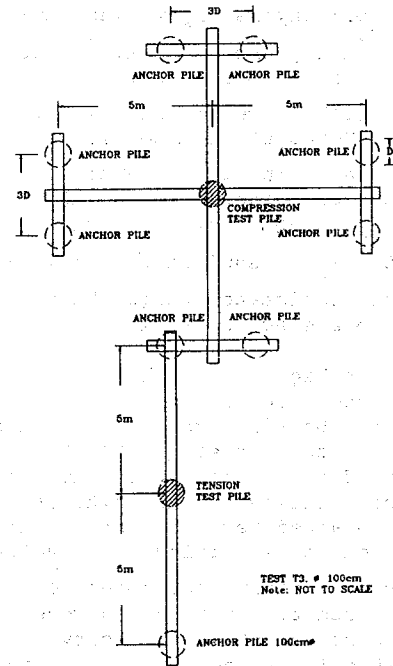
TYPICAL LAYOUT OF TEST PILES, REACTION PILES AND REACTION BEAMS
